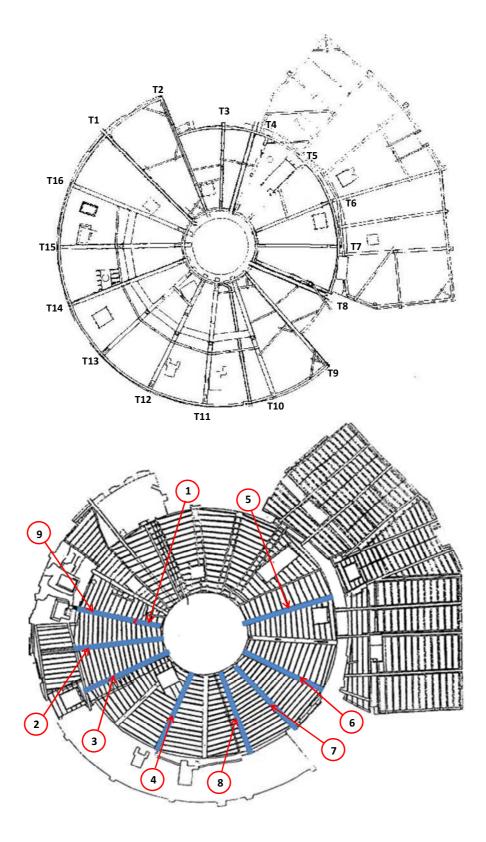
/b: Plan of the pine roof trusses (top) and oak attic floor (bottom) of the Keep to help locate sampled timbers (after Colvin 1982)
